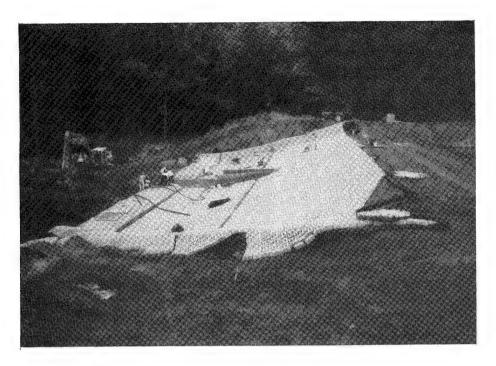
CCM and geotextile filter fabric placed up to crest of dam, Wilkerson Lake Dam
